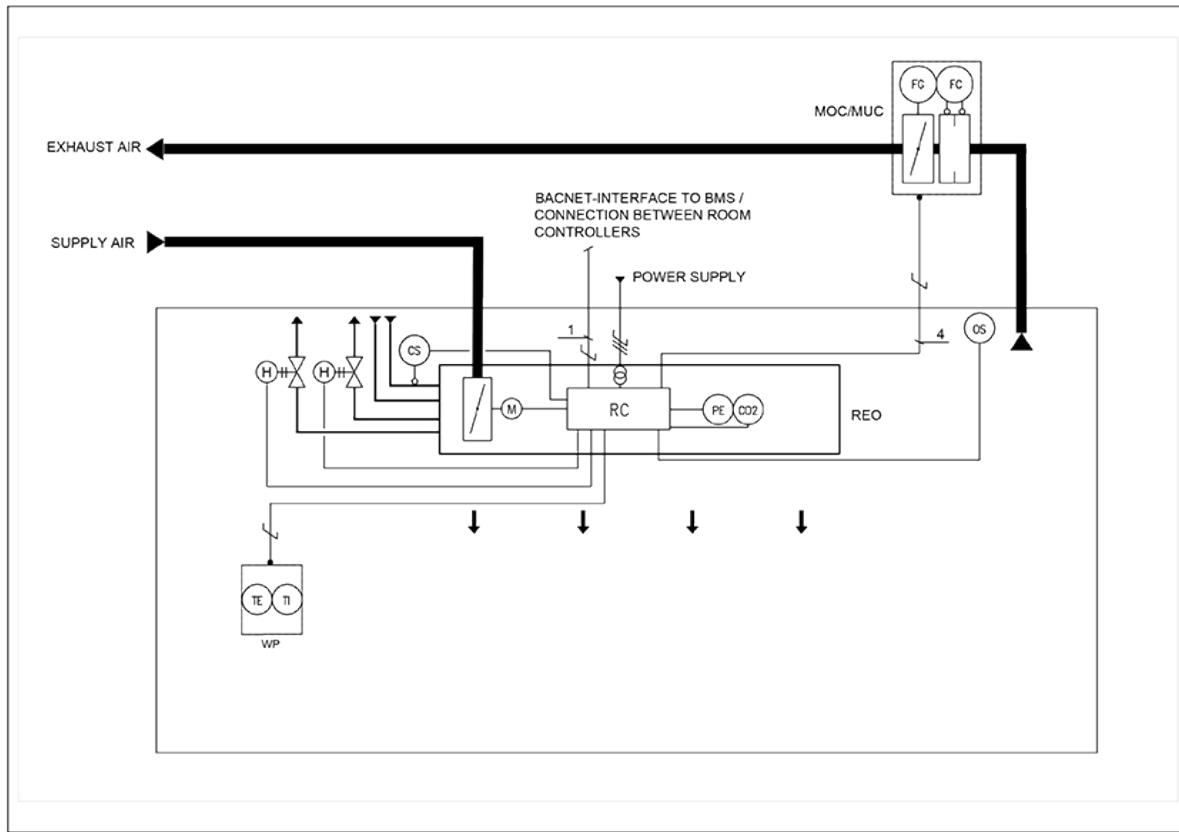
Schematic drawing: Halton Rex Exposed VAV (REO) chilled beam (4-pipe) controlled with Halton Workplace WRA room automation controller
